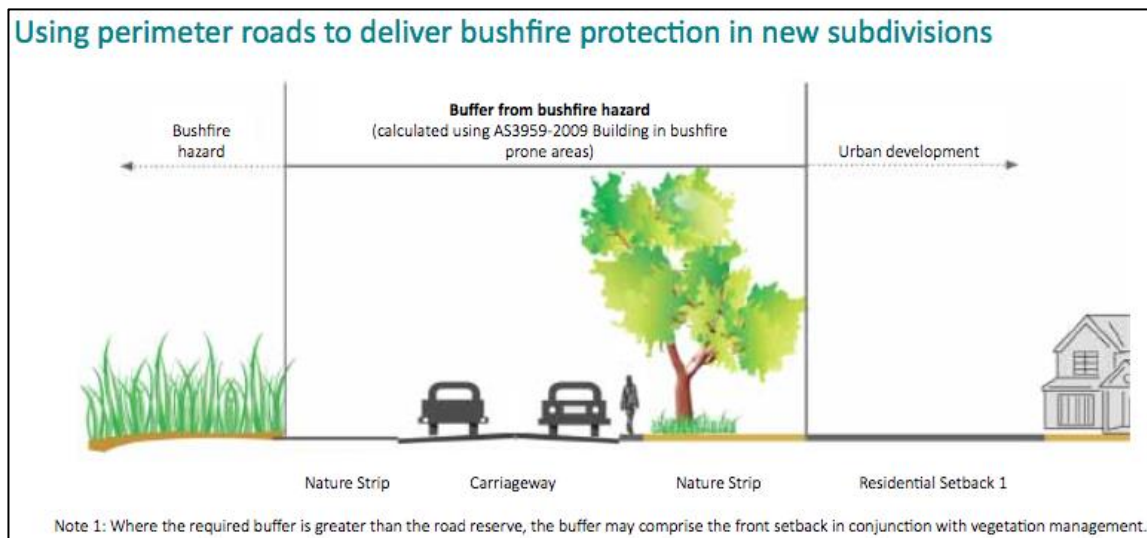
Perimeter road between the site and existing residential areas at Staunton Walk to the south of the site.
